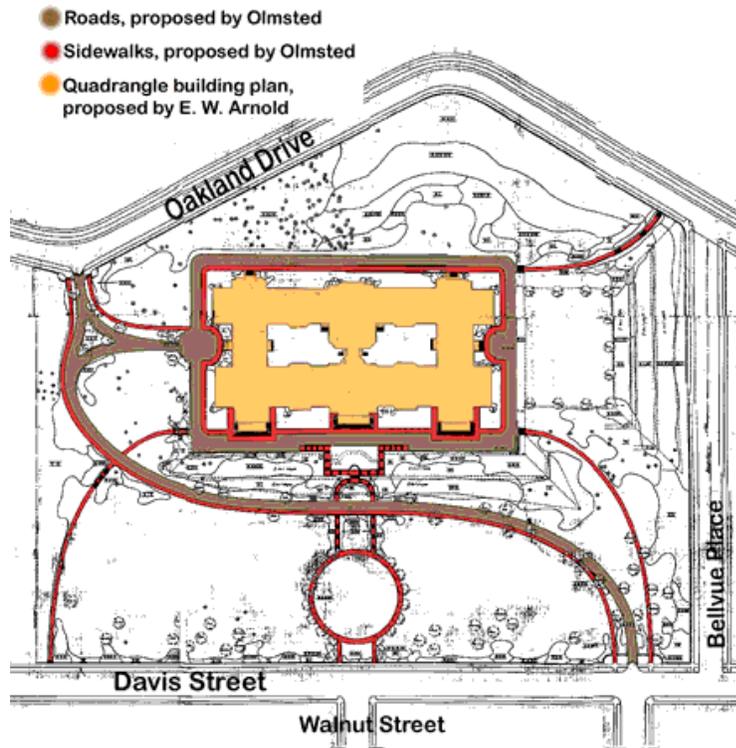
Proposed Additions to the Original Master Plan, E.W. Arnold
